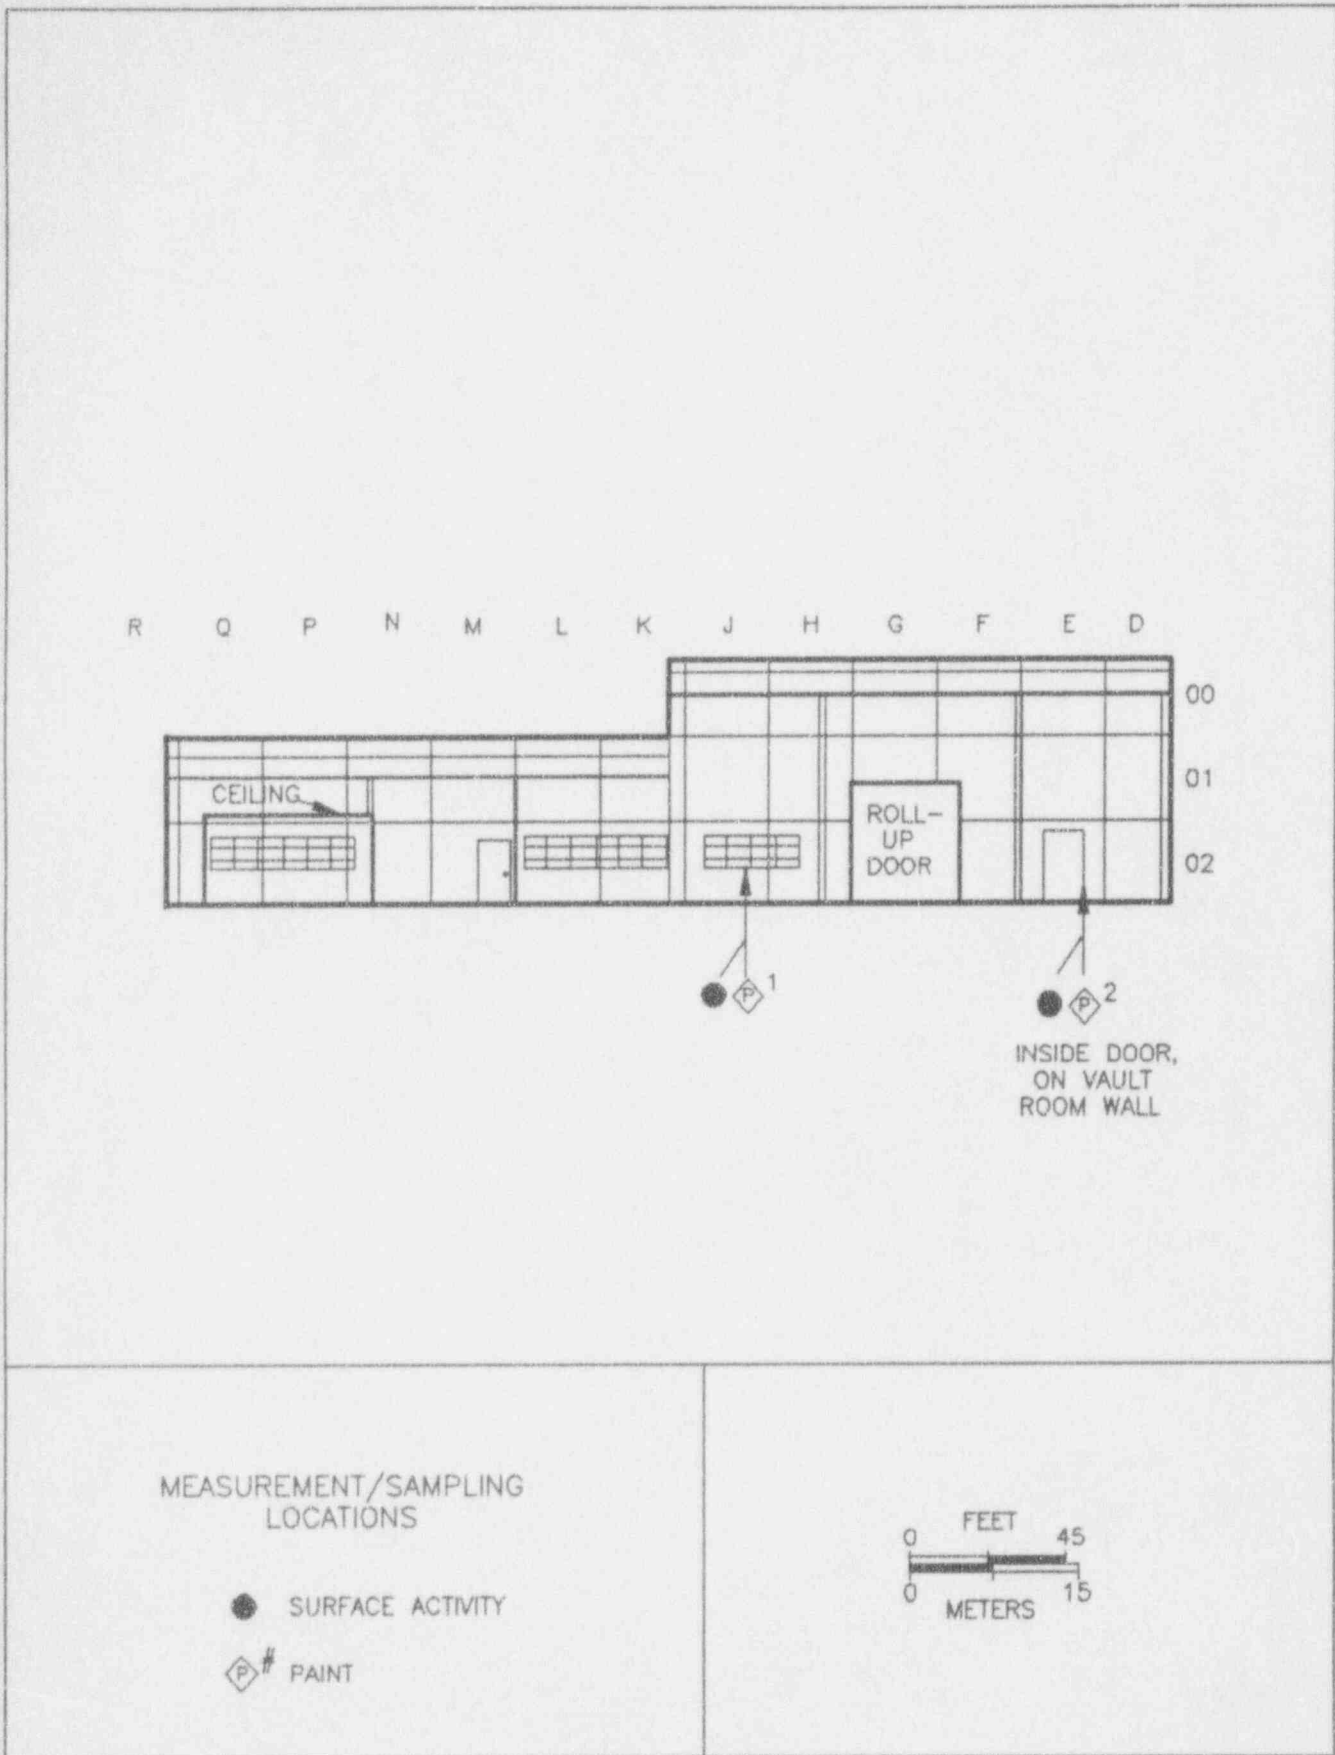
Building 3, North Wall – Measurement and Sampling Locations
